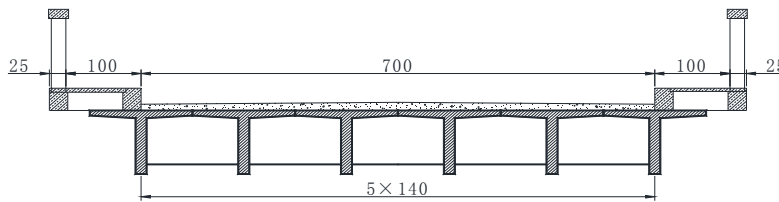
Cross section diagram of Yingjing Bridge (unit: cm)
